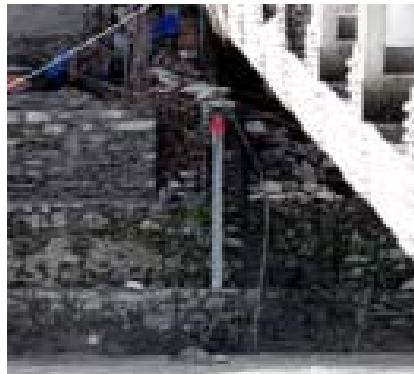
Water level gauge on the concrete Basement (Guatemala)
